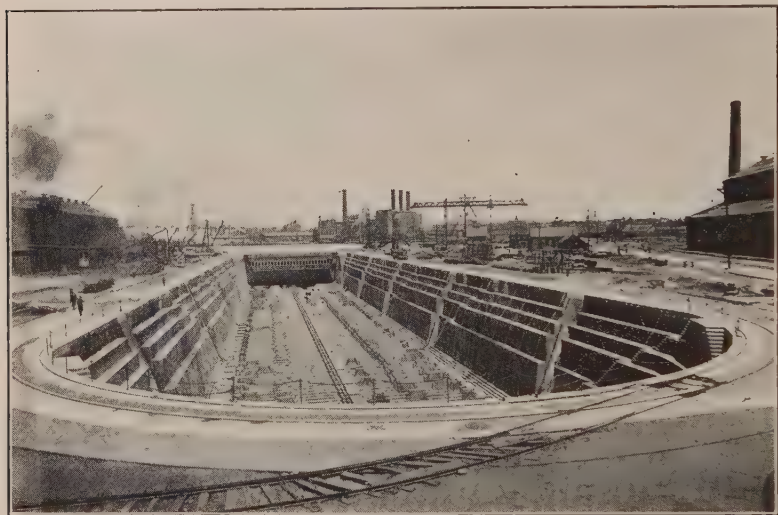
Concrete Dry Dock No. 4, U. S. Navy Yard, Brooklyn, N. Y. Waterproofing material incorporated in the concrete; not entirely water-tight, there being some slight weeps.
